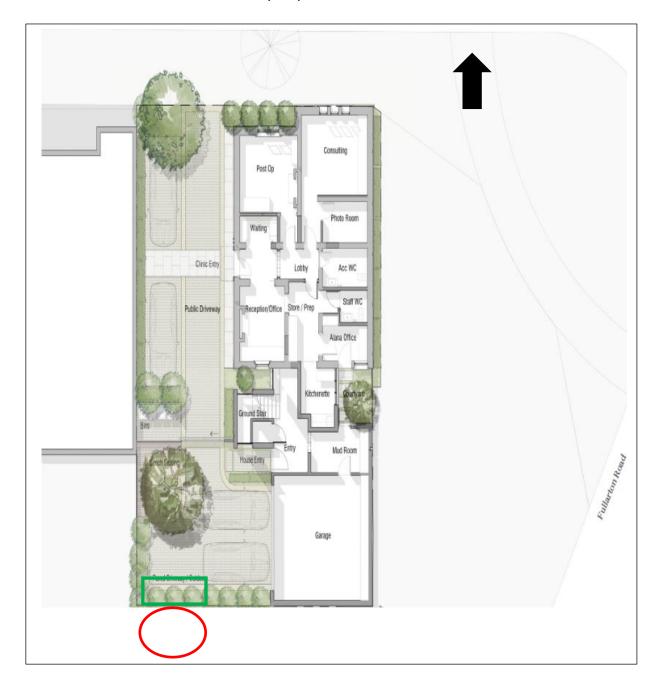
shows the plans of the proposed development at 120 Rundle Street, Kent Town SA 5067 and the subject tree is located in the rear neighbouring property at 31 Fullarton Road, Kent Town SA 5067.
